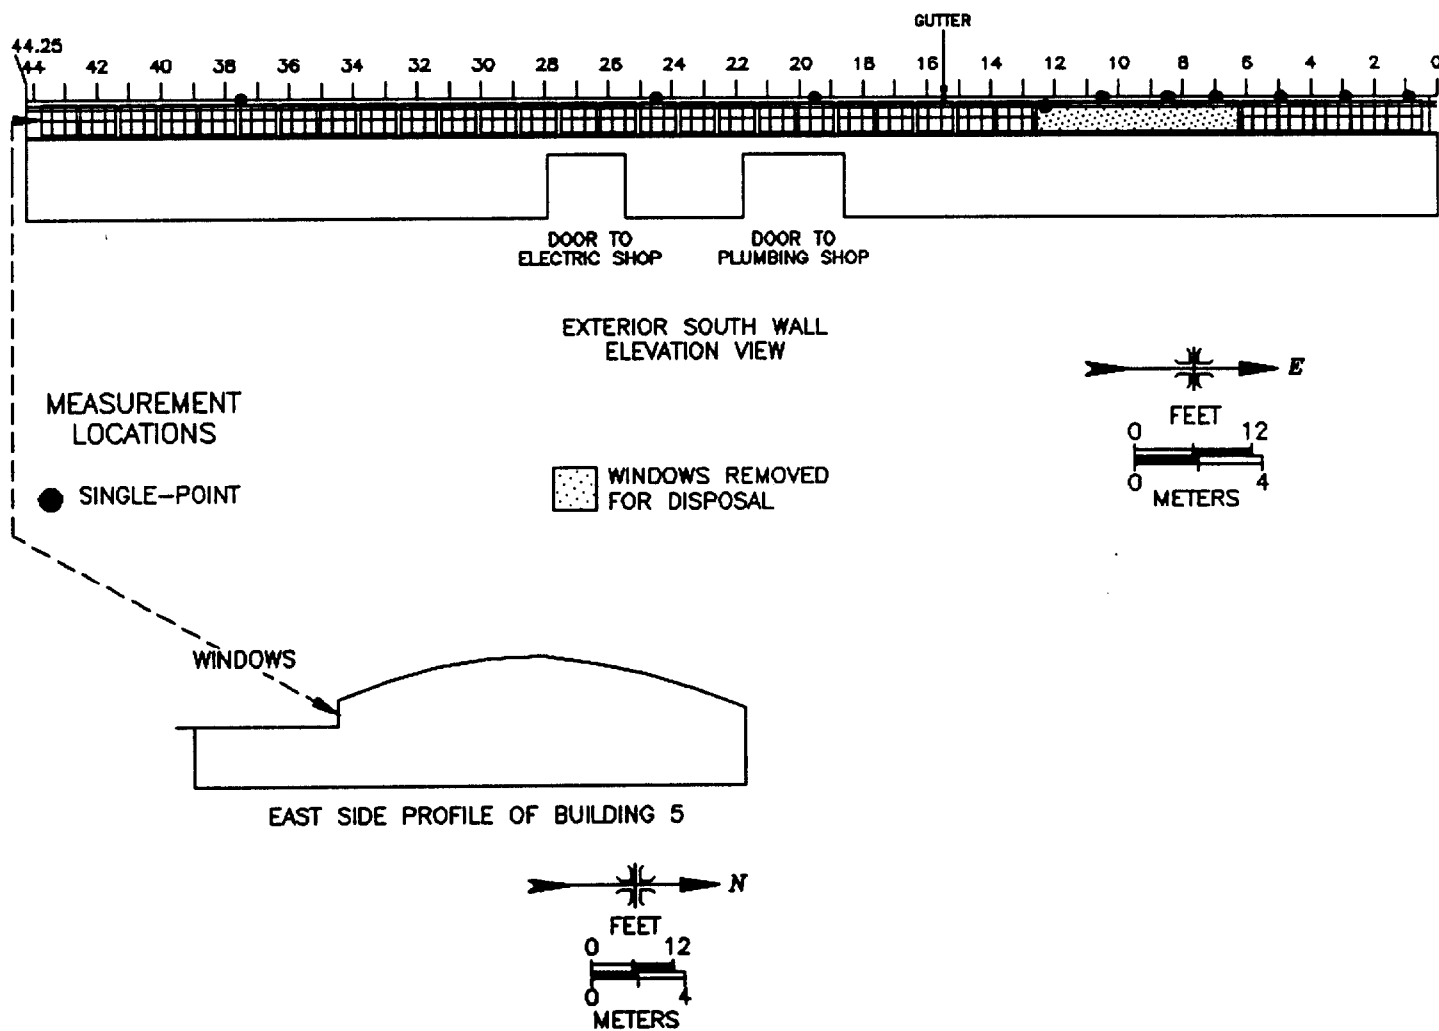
Building 5, East Side Profile with Detail of South Side Windows – Measurement Locations
